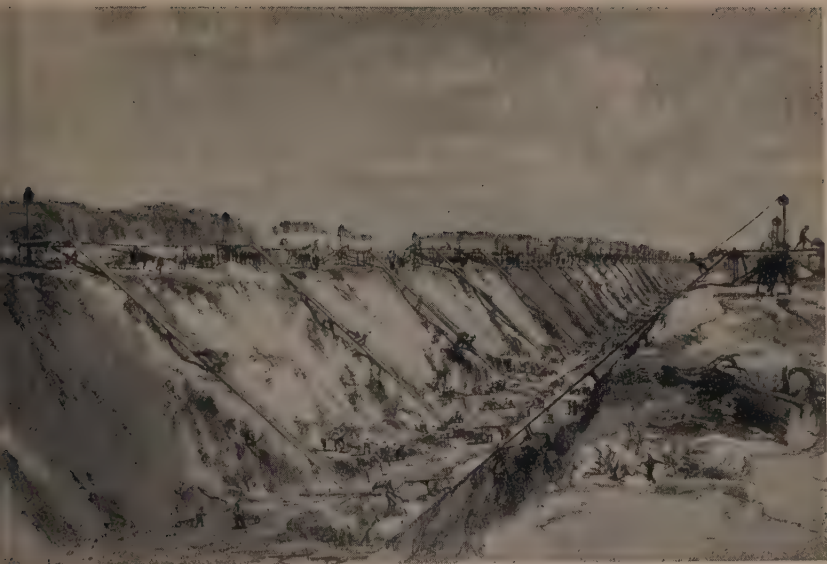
MANUAL EXCAVATION ON THE LONDON-BIRMINGHAM LINE
